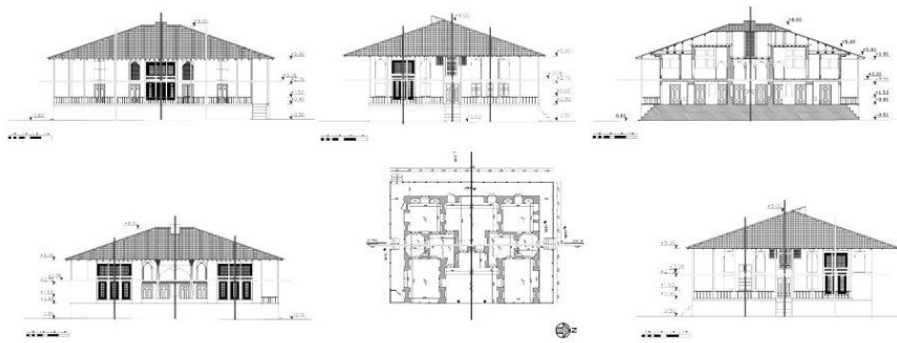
Plans, Facades and Interior Facades (Rooms), Empty and Full Spaces and Symmetry of Them
